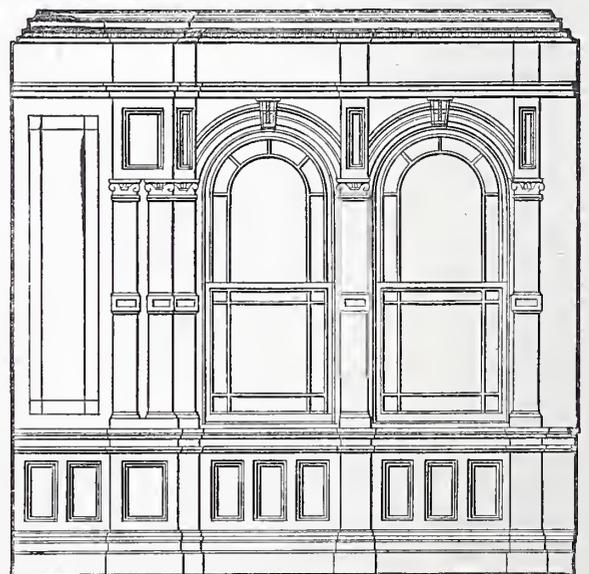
Partial Elevation of End of Room.—Scale, 1/4 Inch to the Foot.
